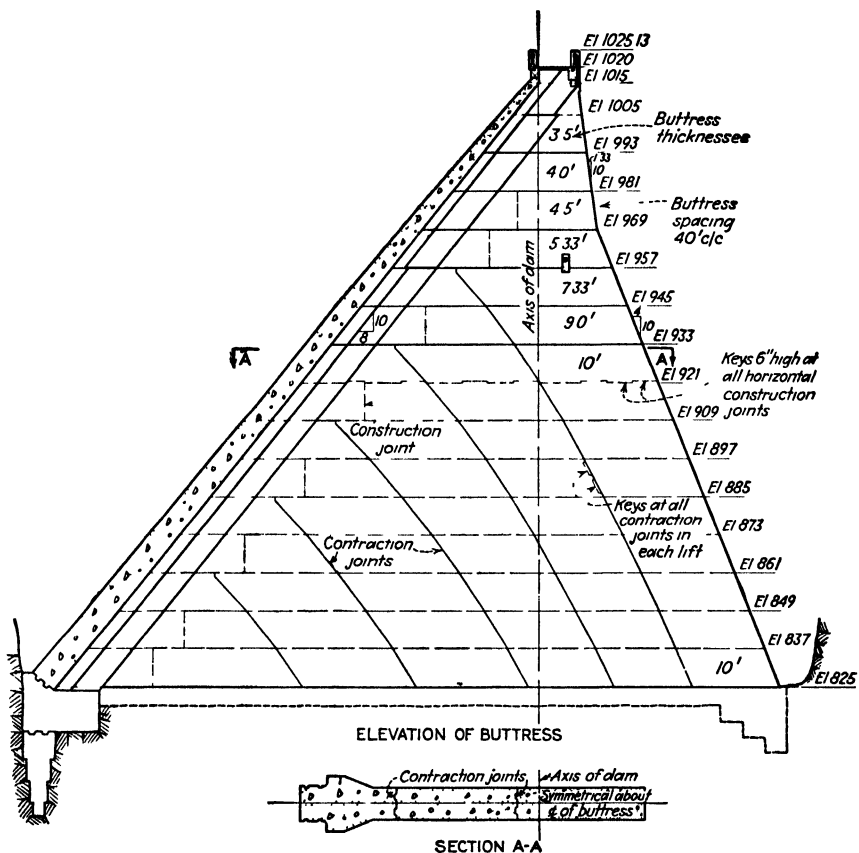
Possum Kingdom Dam (renamed Morris Sheppard Dam). Bulkhead buttress and sections; keys in contraction joints (inclined joints).
